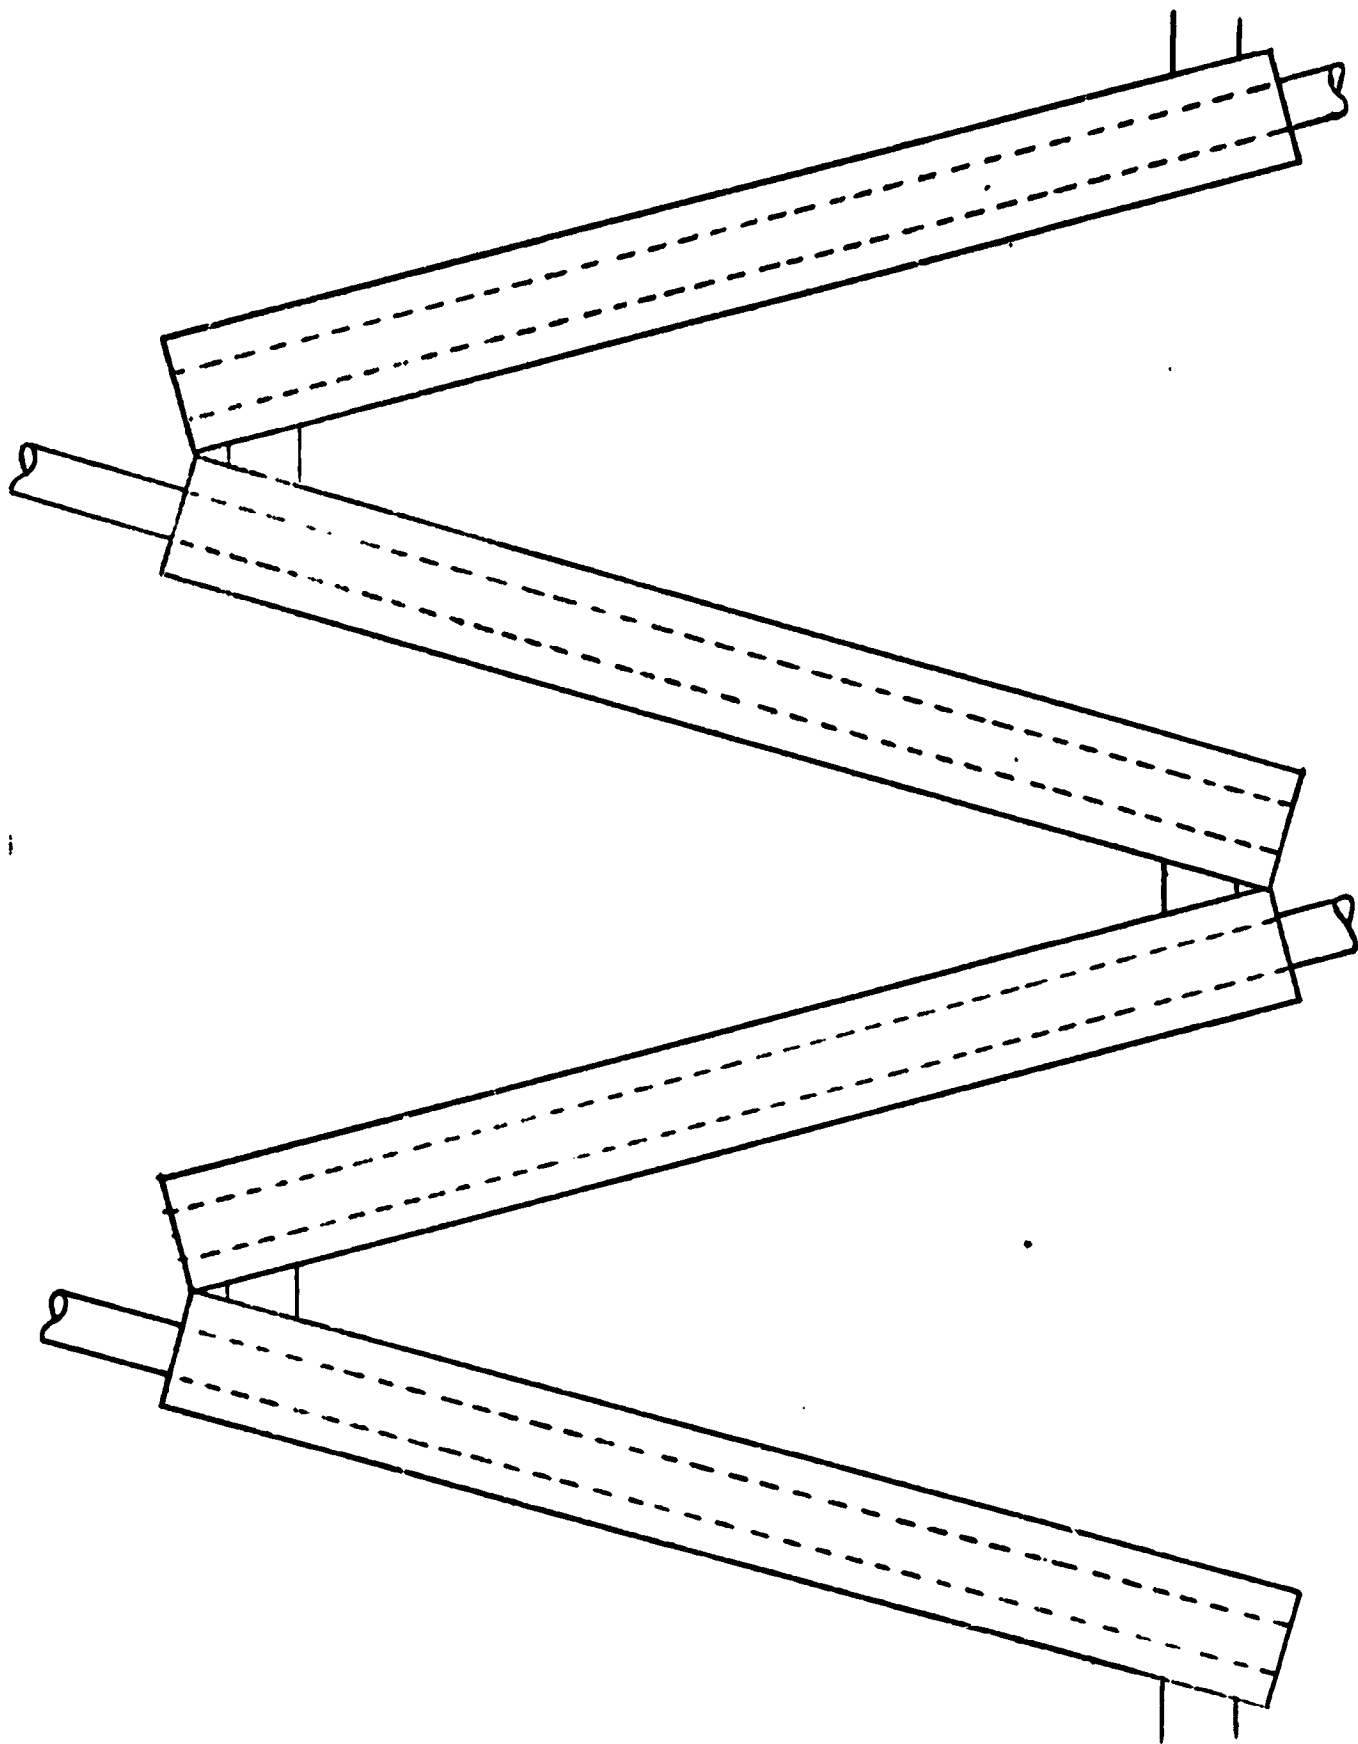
MANIFOLD DETAIL FOR RIGID PANEL RADIATOR
